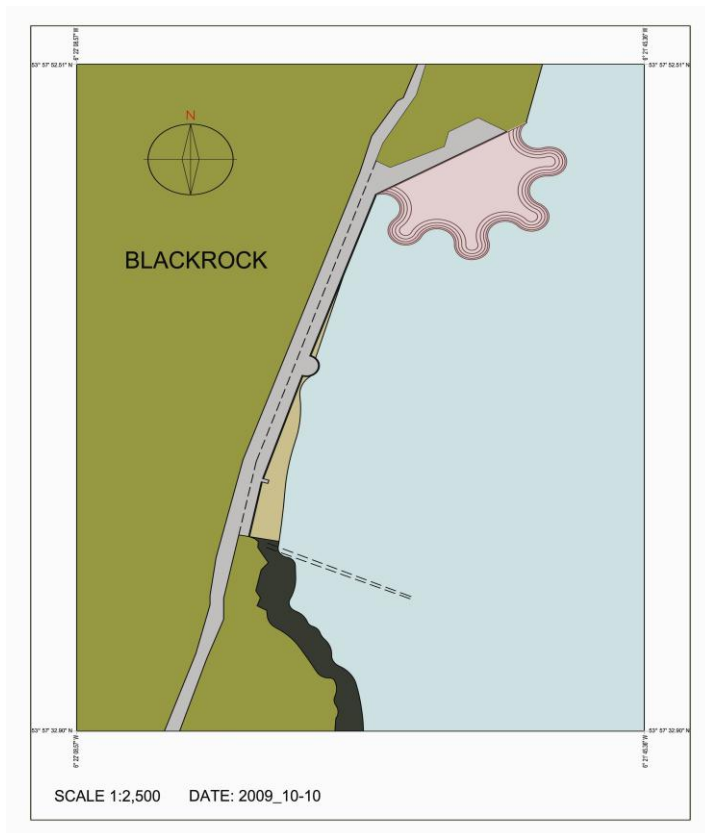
Palmate infilled area to SE of car park wall to reduce wave-induced scour at the beach.
